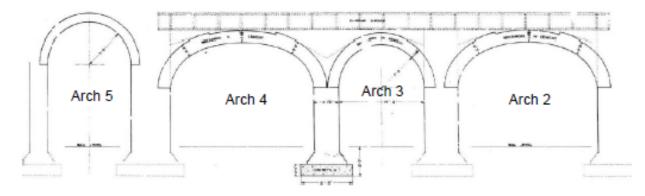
View on east elevation of current bridge form (looking west). Arch 1 not shown in above illustration.
